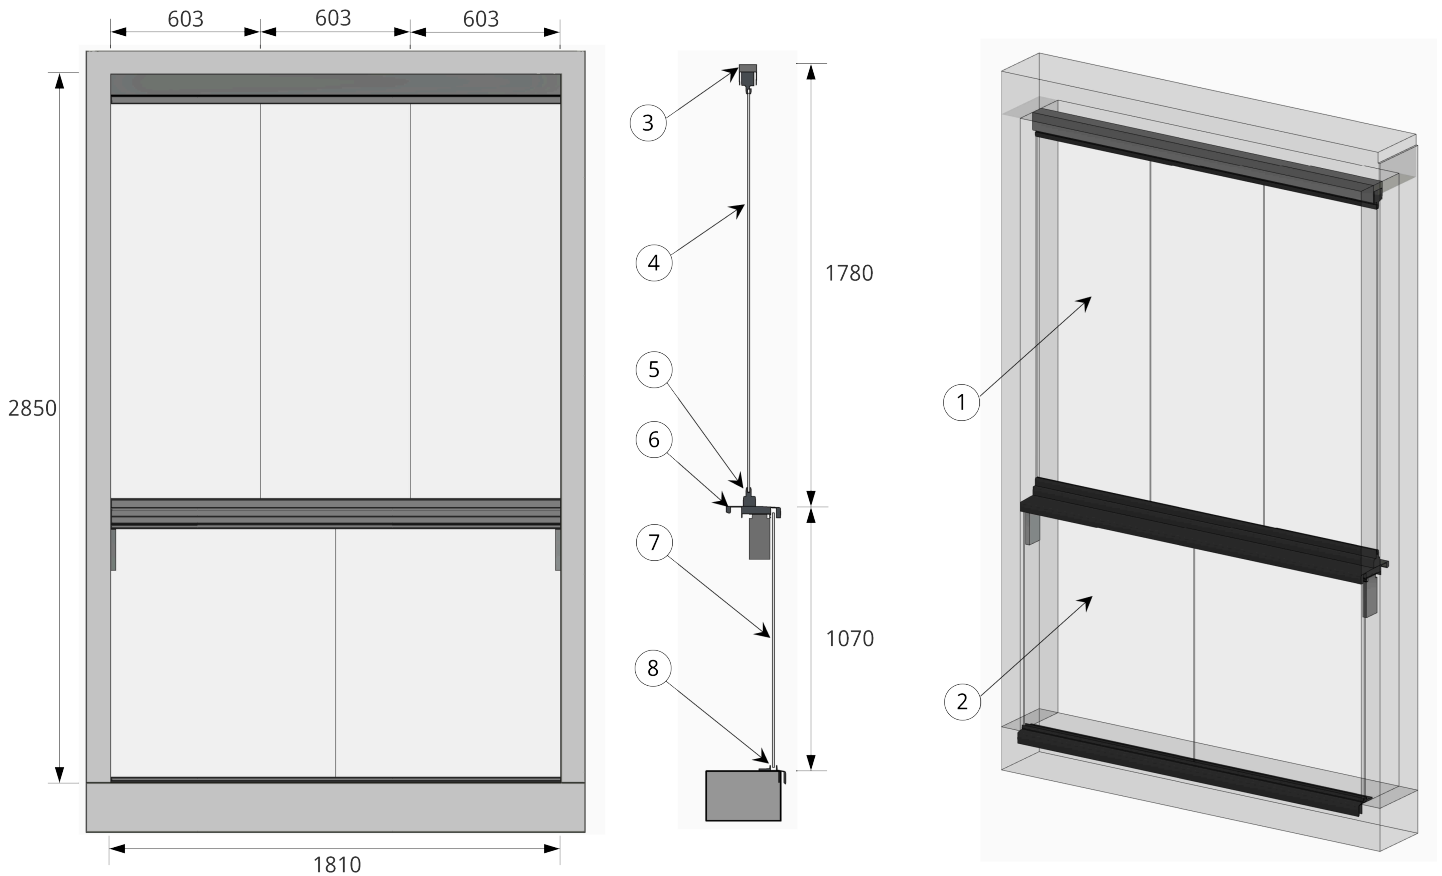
Lumon Glazing System: isometric view (right); cross-section view (middle); and elevation view (left) (all dimensions in millimetres)
